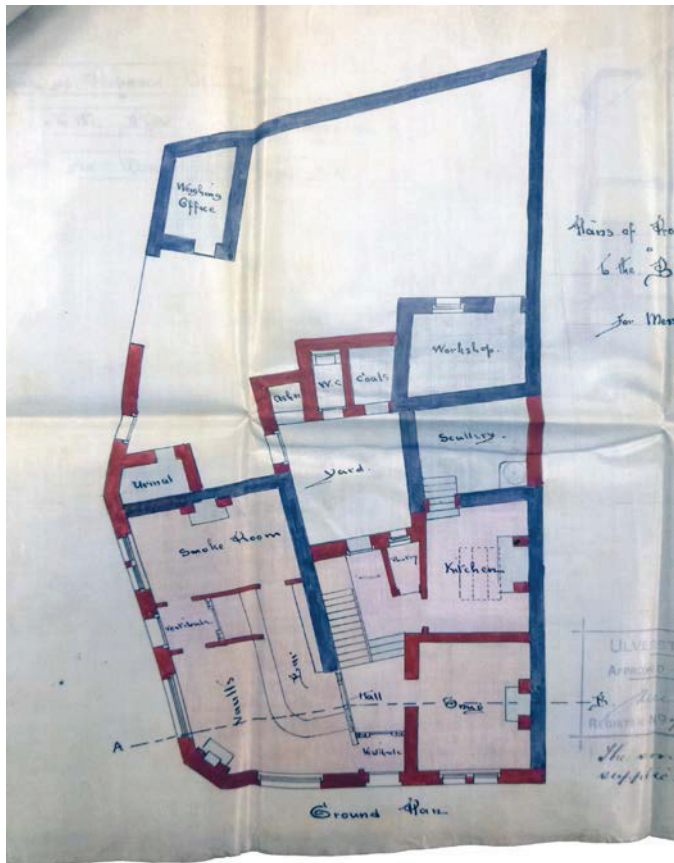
(left): Ground floor plan for proposed alterations, 1894 (north is to the left)
